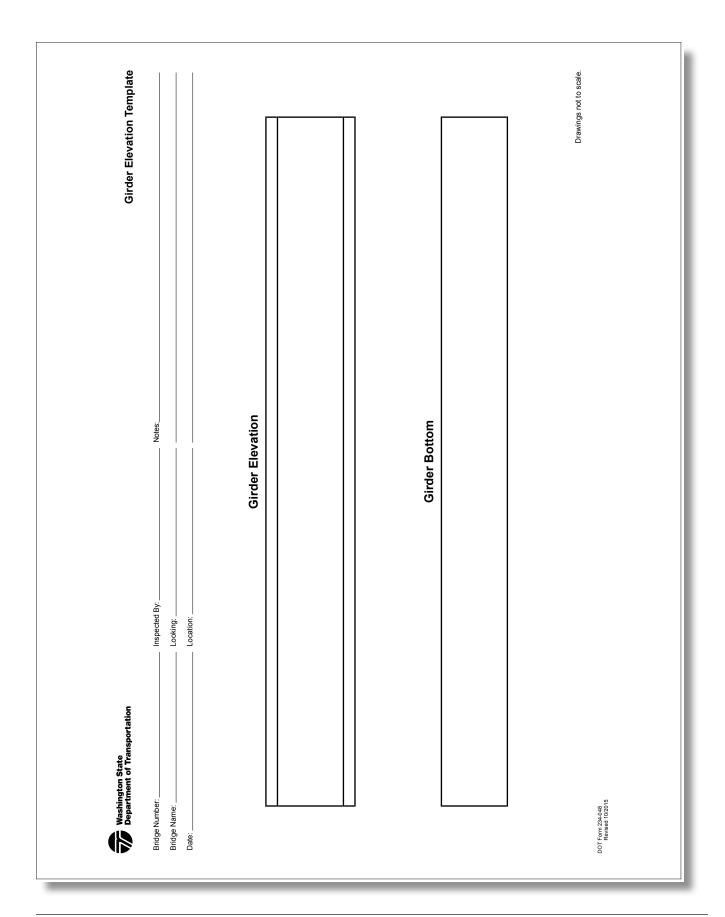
DOT Form 234-048 Girder Elevation Template
